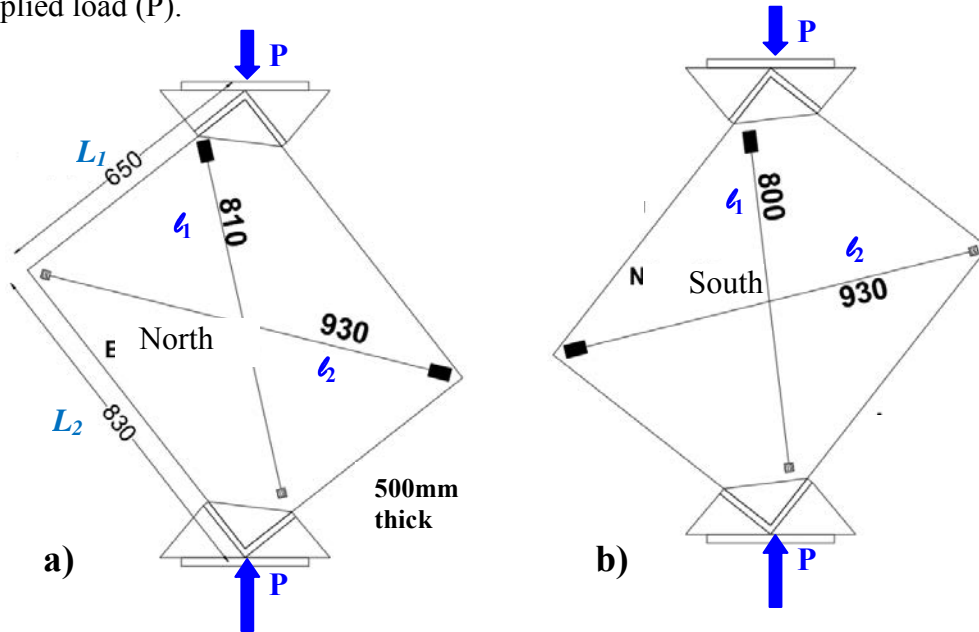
Experimental set up and instrumentation for the diagonal compression test of the stone masonry specimens on façade (a -North) and facade (b - South).
